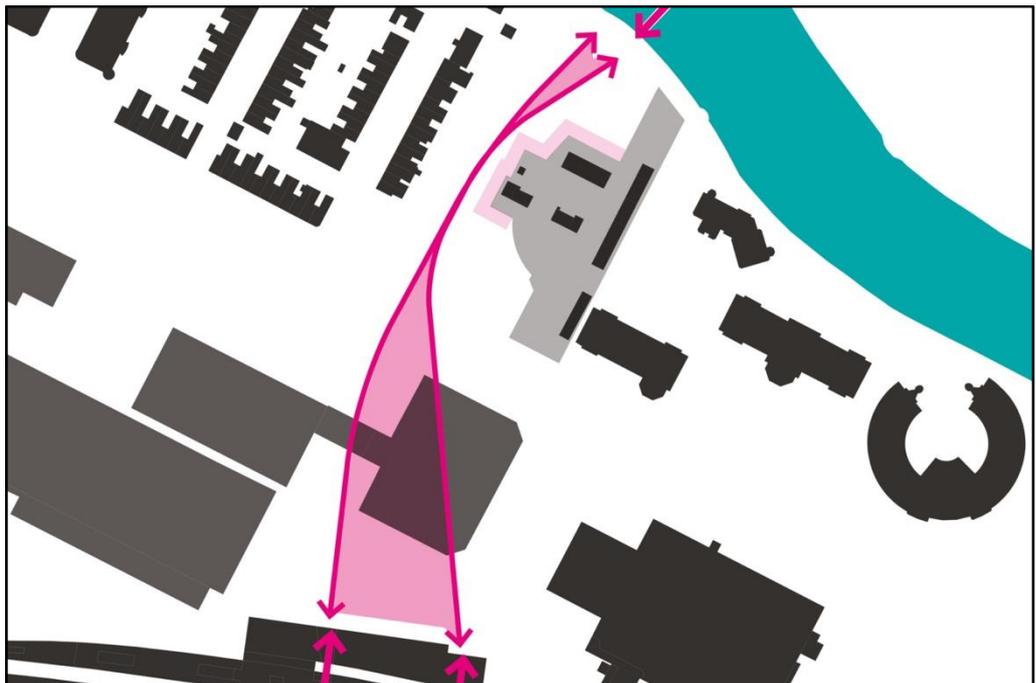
Plan to demonstrate a direct, arched corridor between the Station and Bridge, arching around the retained SSE equipment with 2m offset (shown light pink)
